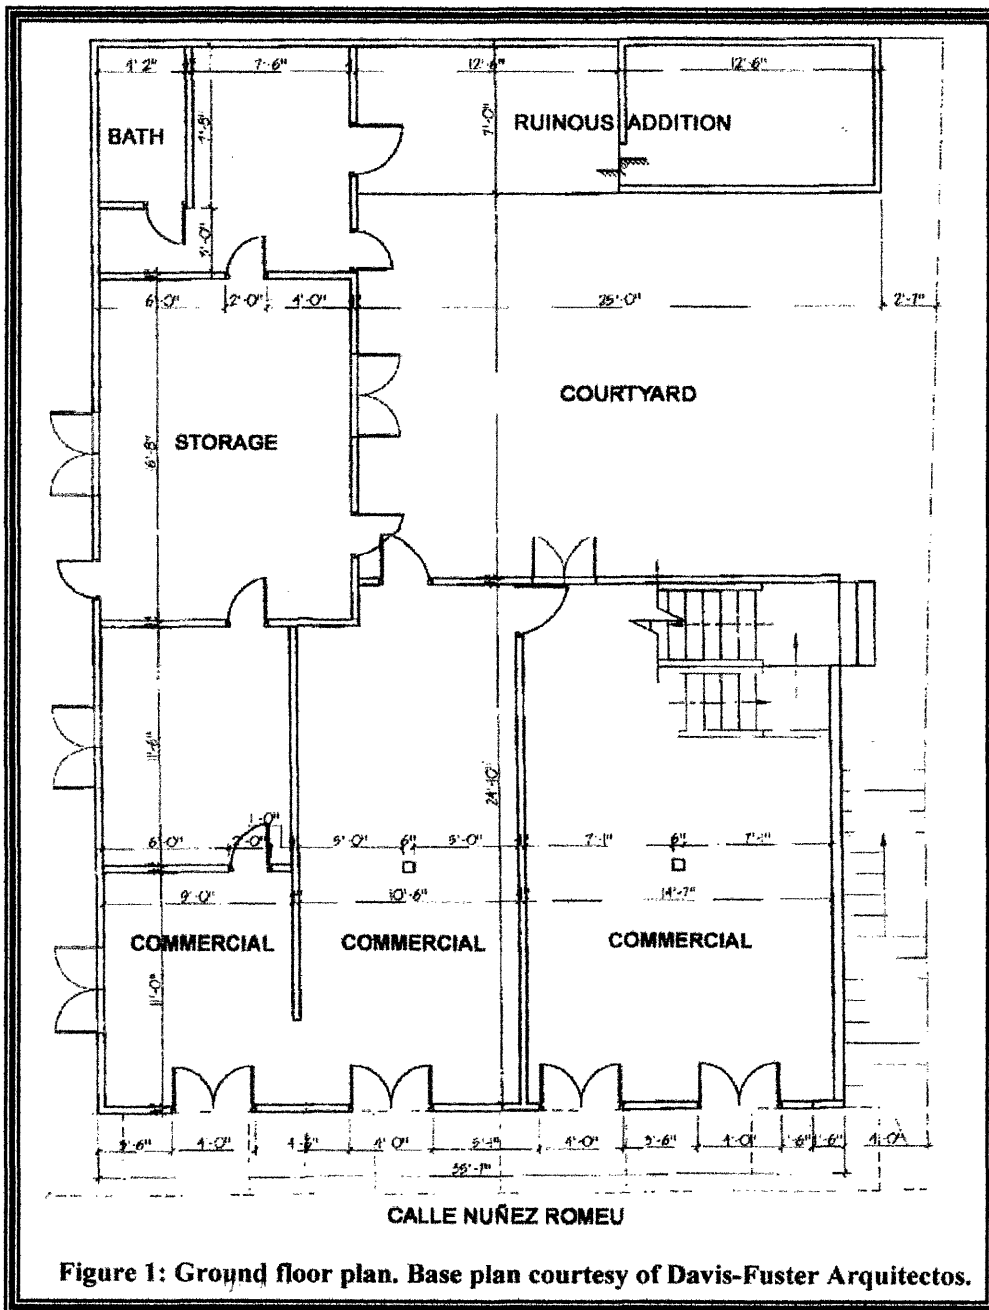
Ground floor plan. Base plan courtesy of Davis-Fuster Arquitectos.
